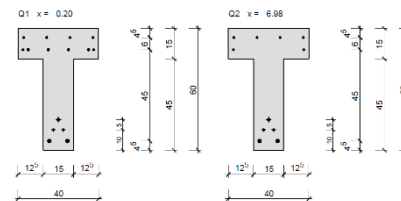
Longitudinal prestressed beam T60 used in prefabricated NSR structure
